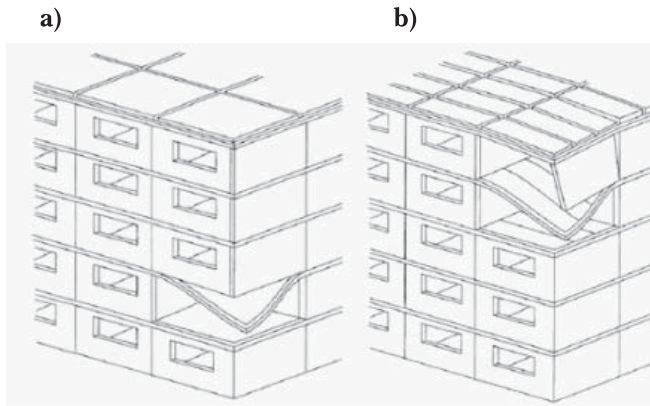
A secondary cantilever structure after the destruction of external walls in the corner of the building
